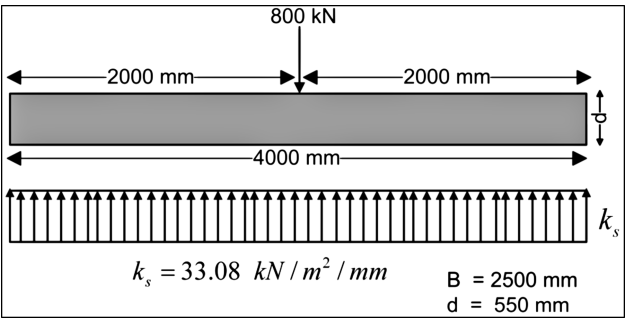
C.5 Details of loading and modulus of the subgrade reaction of a beam resting on an elastic foundation (Example 12.2).
